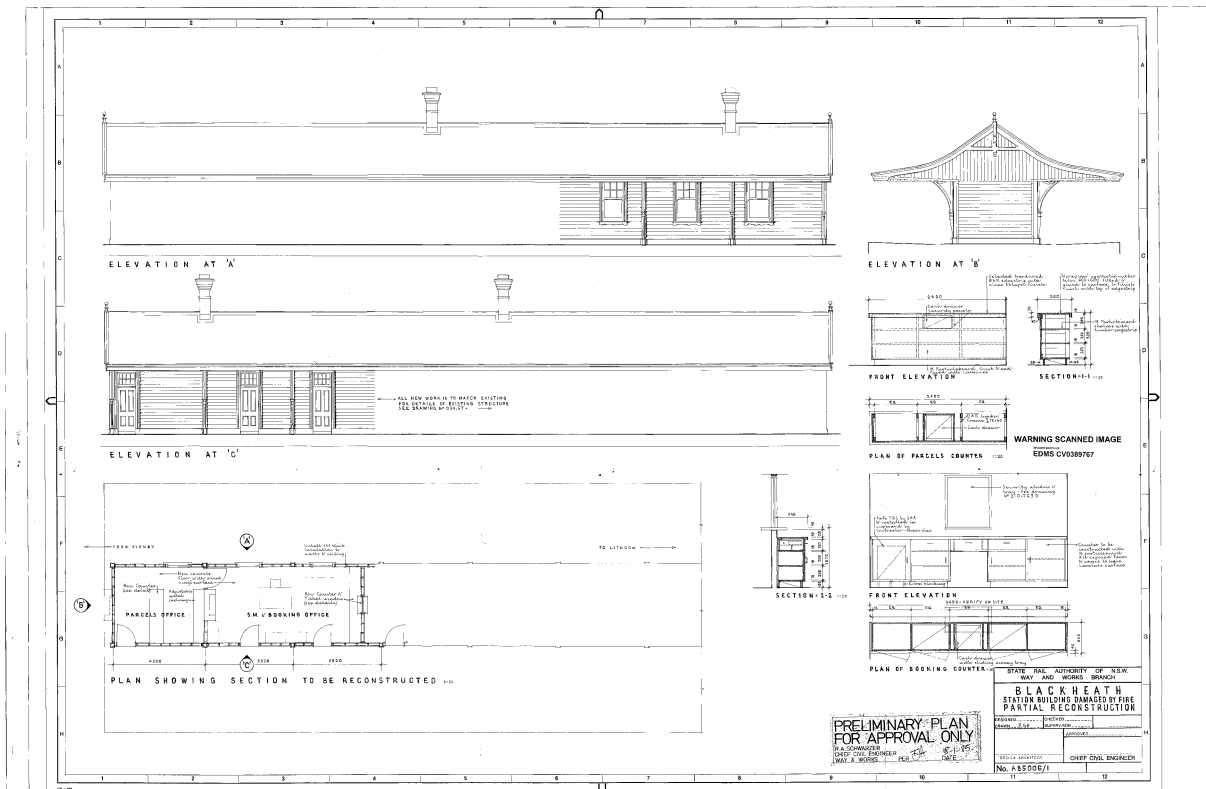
Preliminary plan showing the reconstruction of the station building after the 1985 fire Source: Sydney Trains Plan Room, CV0389767
